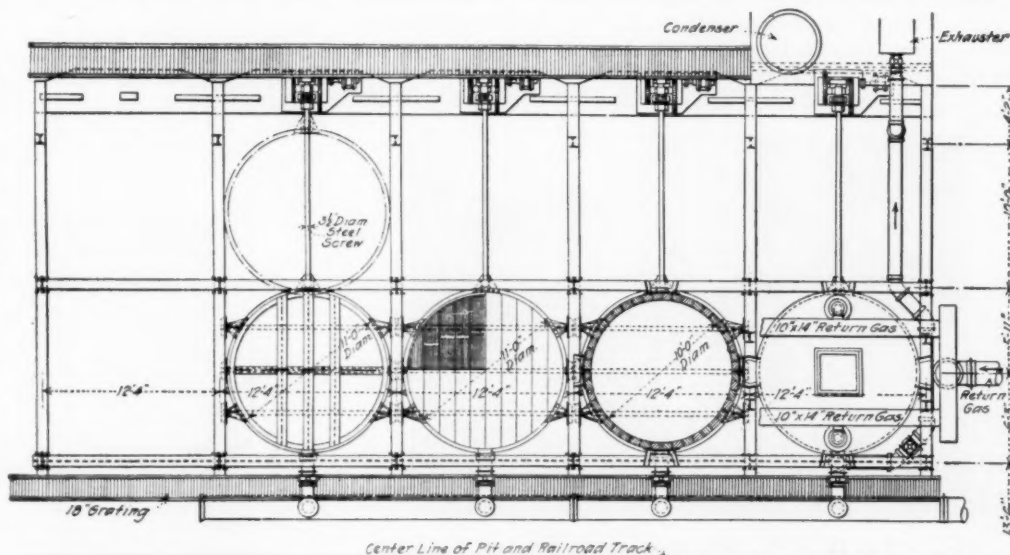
FOUR UNITS IN PLAN, WITH DETAILS OF BRICK LINING AND GRATES
